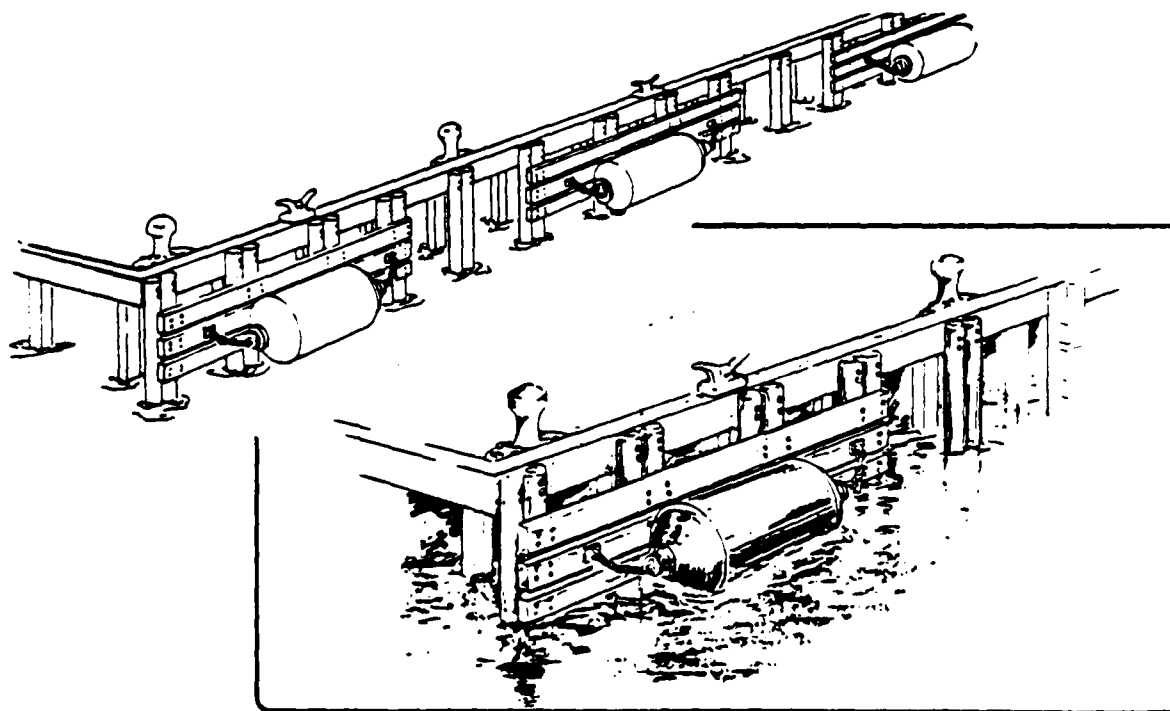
Horizontal Timber Bearing Surface for Foam-Filled Fender.
